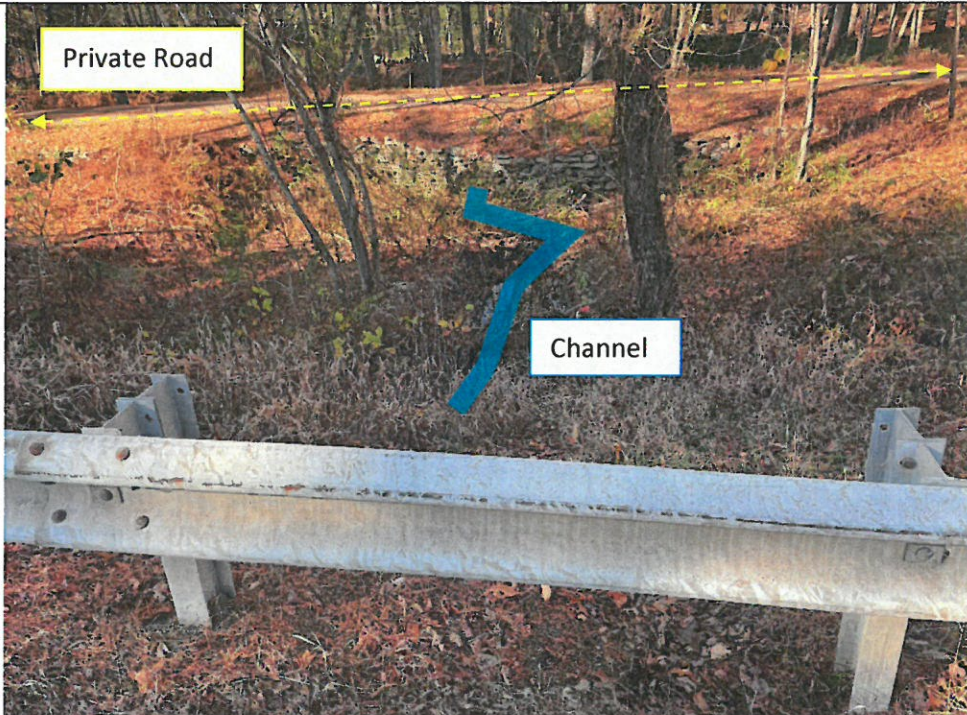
View of the primary spillway's discharge channel from the roadway looking downstream. Note the private road and stone masonry wall/culvert supporting it.
